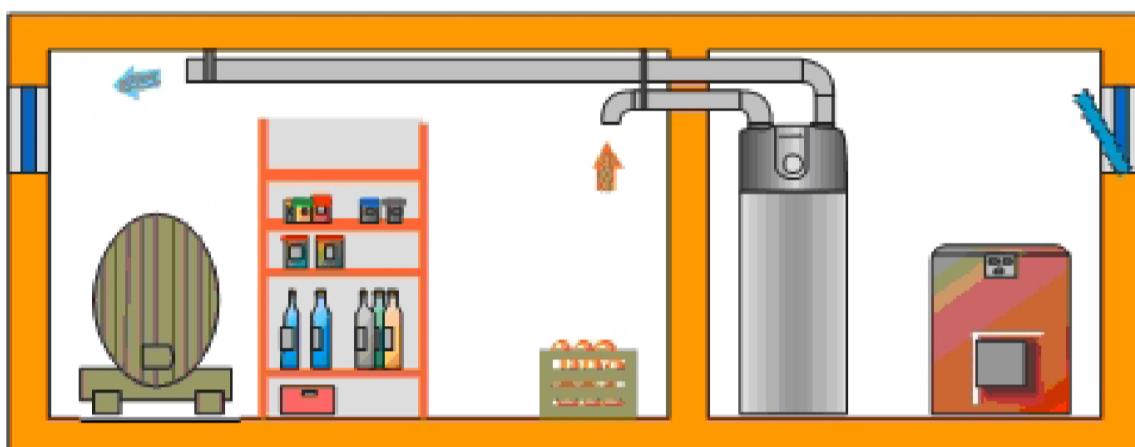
Air is supplied from a neighbouring room and discharged back. Cooling of a storage room.
